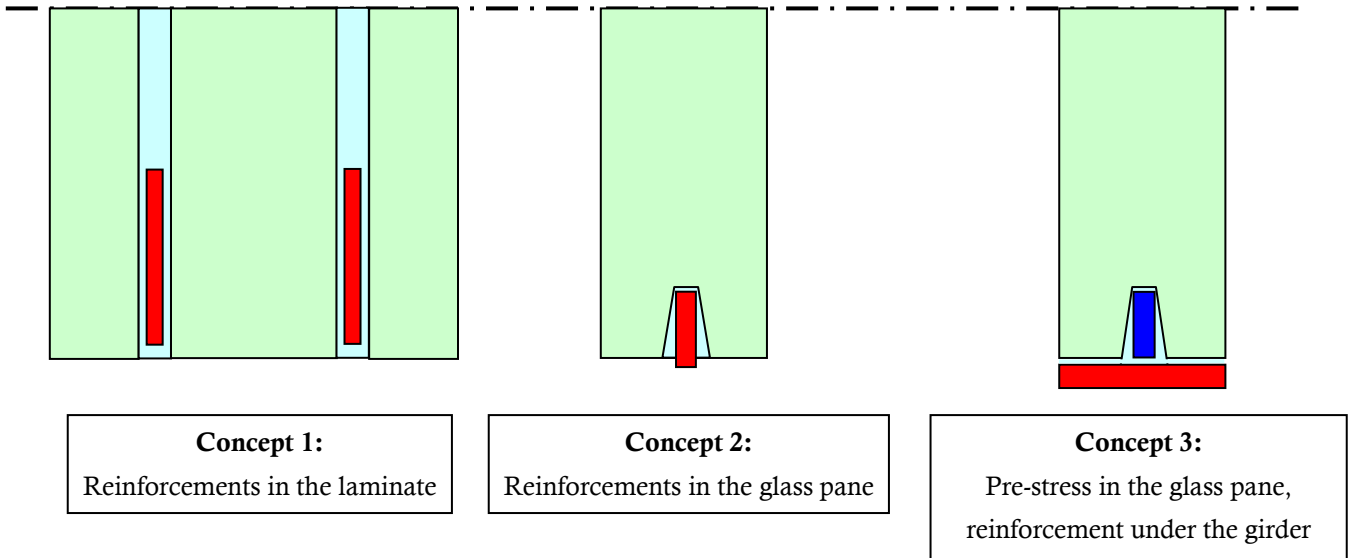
, Simplified cross-sectional view of bottom of concept girders.
